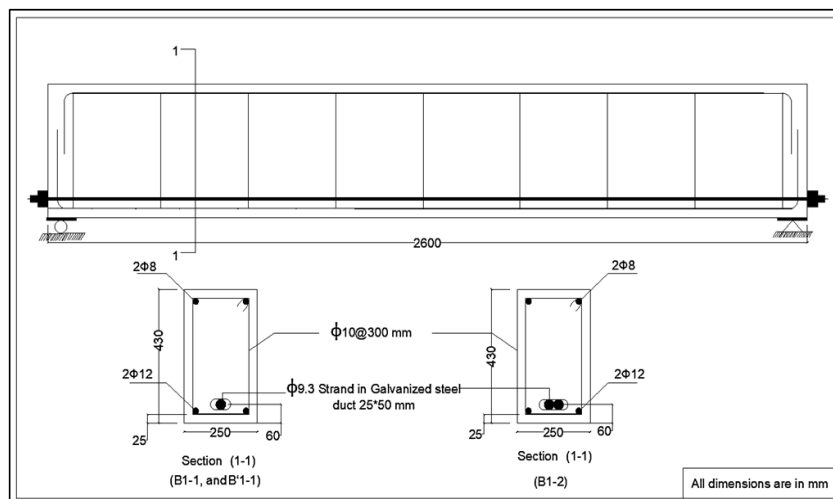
Details of beams B1-1, B'1-1, and beam B1-2
